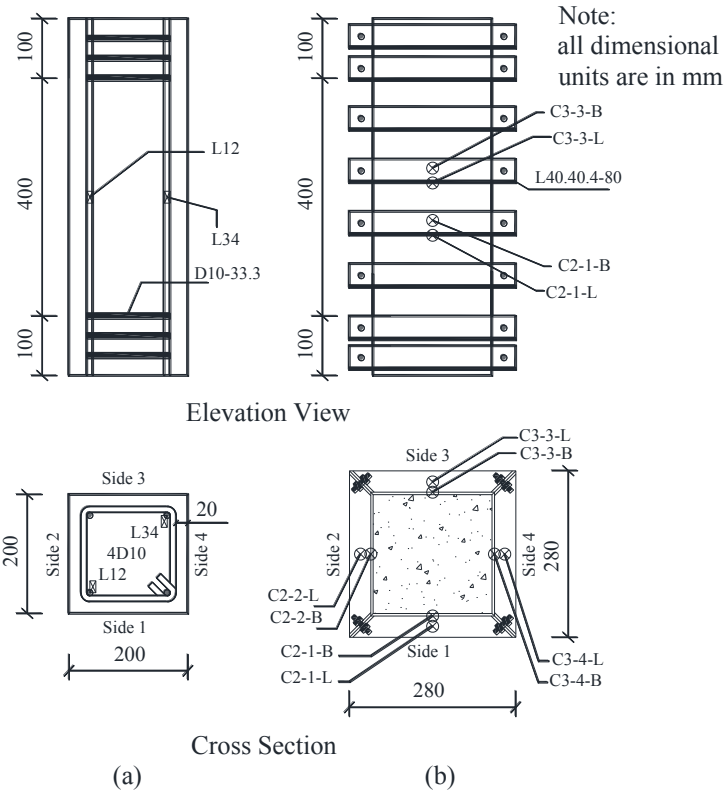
Elevation view and cross section of Specimen S01 : (a) reinforcement details ; and (b) external steel collars
